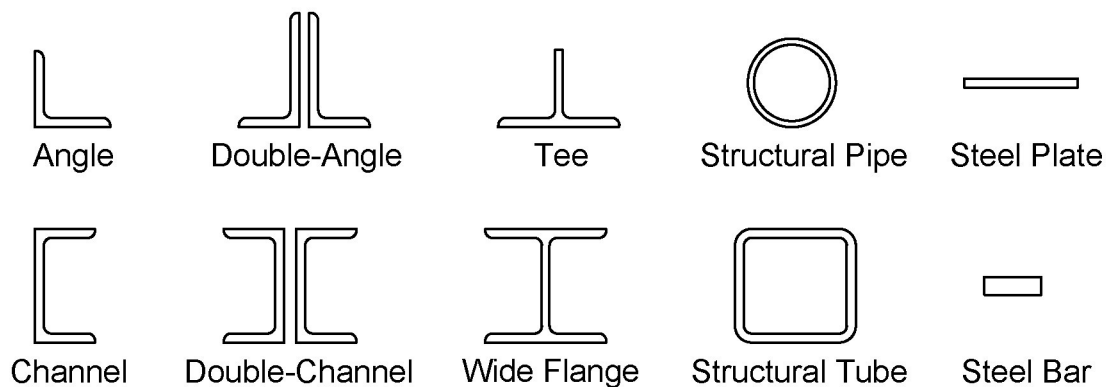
Typical cross-sectional shapes of structural steel used for the bracing of frame structures.
